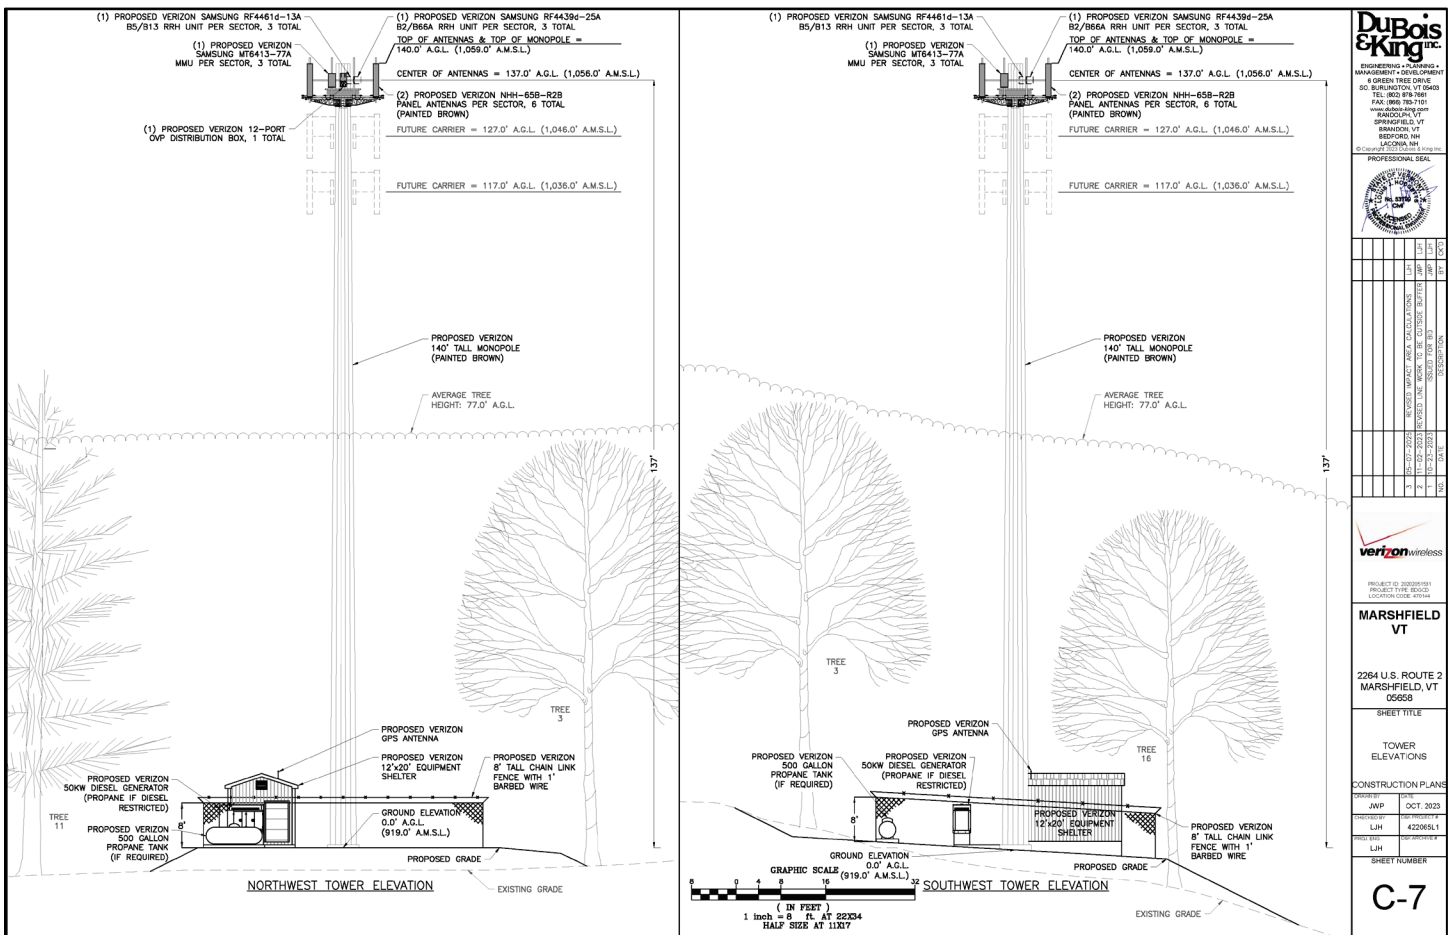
Northwest and Southwest Tower Elevations provided by the Petitioners (Exhibit LH-1 Permit Plans – Sheet C-7)
